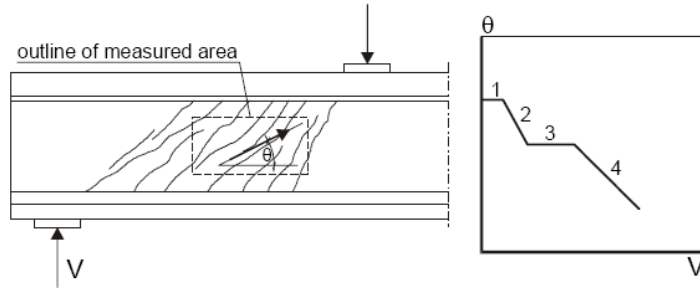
Rotation of the concrete struts as measured on the web of beams with shear reinforcement, schematically represented (Walraven, 1995 and 1999)
